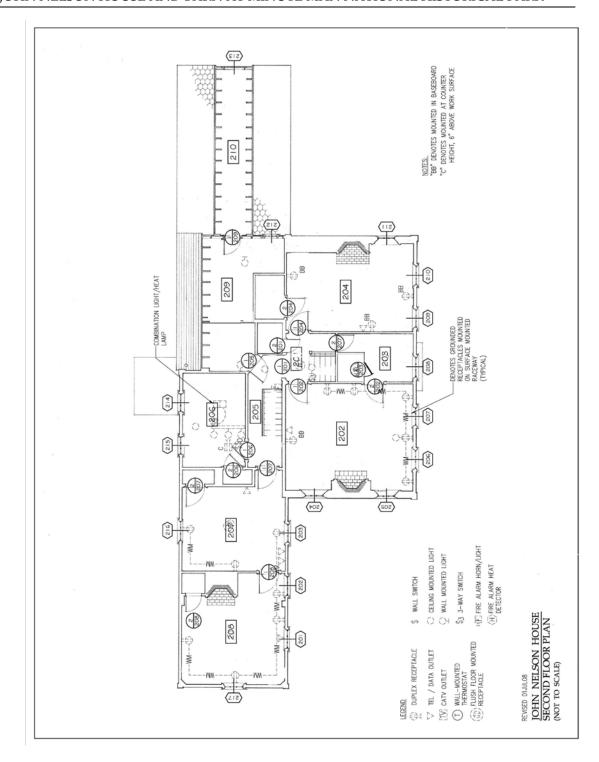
Mechanical, Electrical, and Plumbing key plan, Second Floor.
